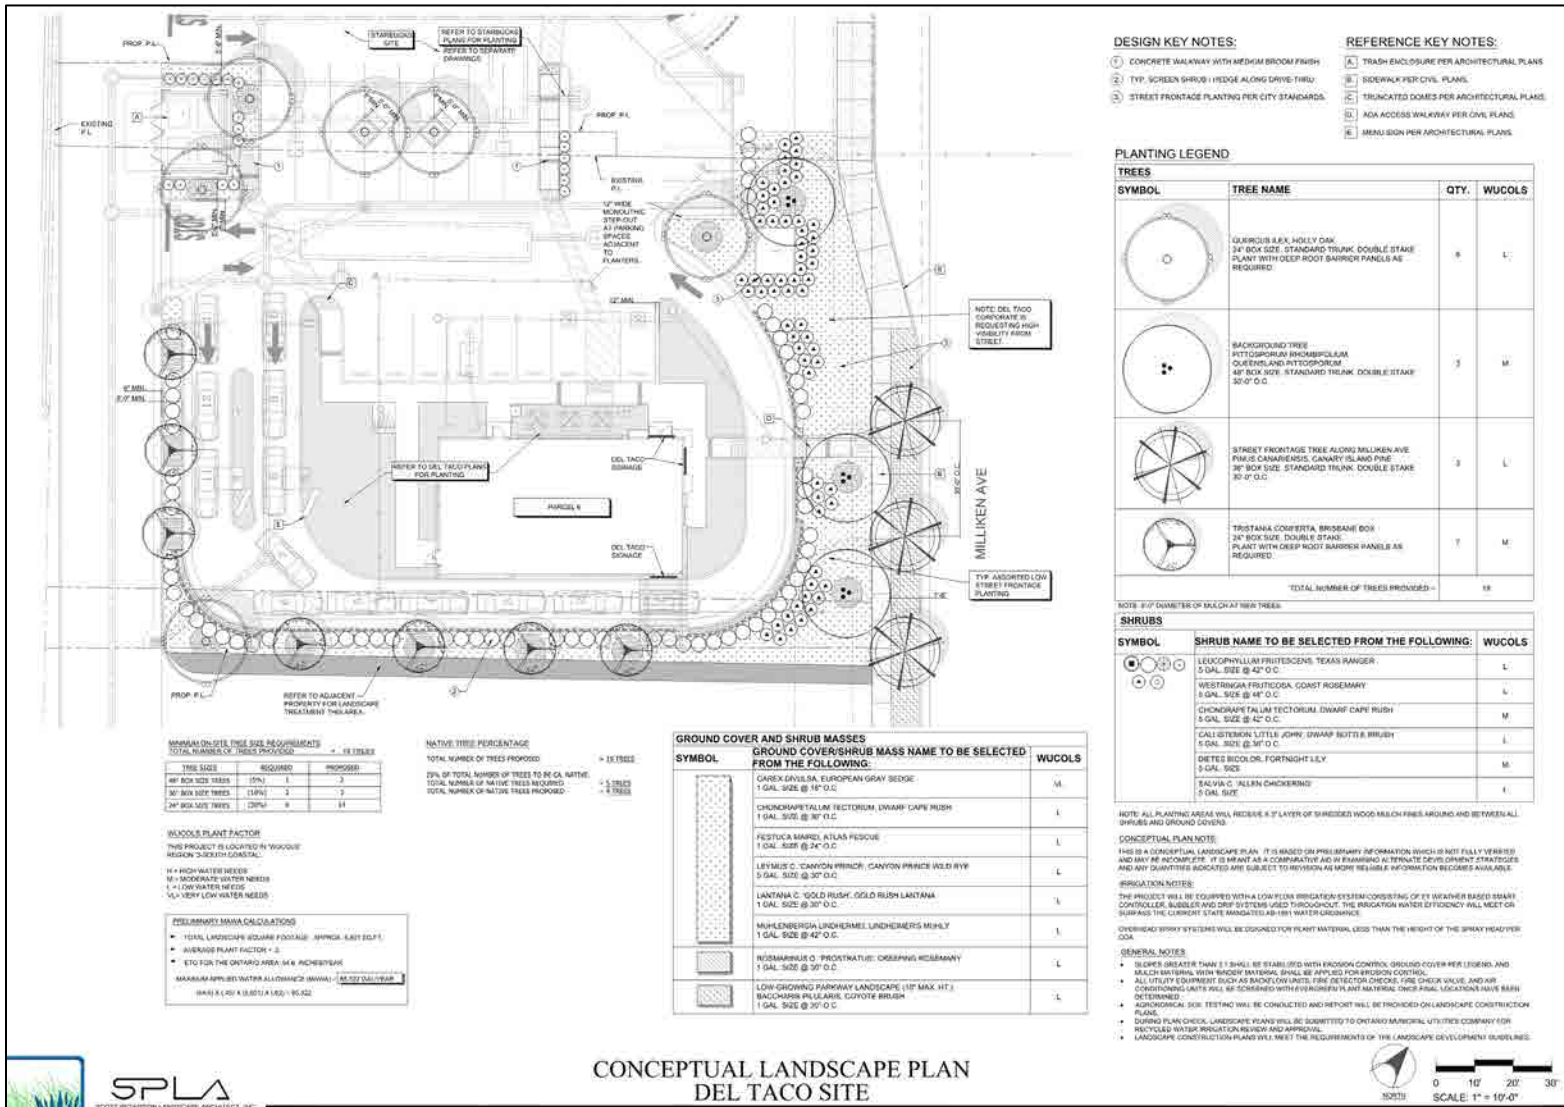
Exhibit F: LANDSCAPE PLAN (BUILDING ADJACENT PLANTERS)
